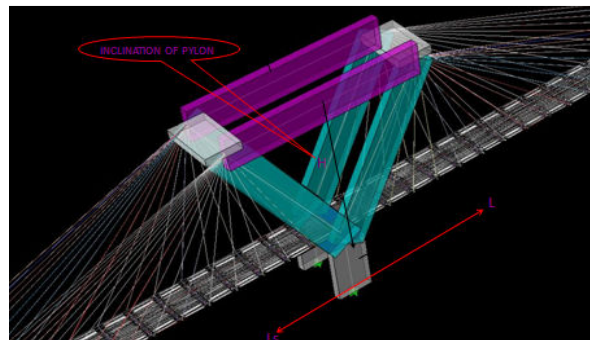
Y-Shaped pylons for Cable-stayed Bridge (Spread Pylon)
